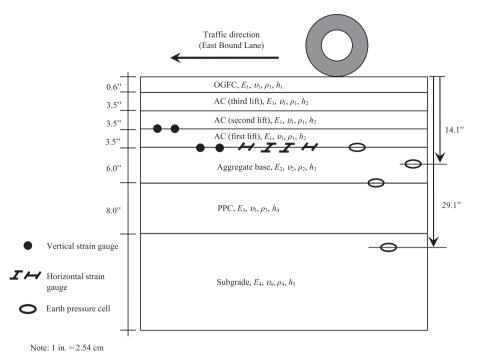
Instrumented section at MP 141 on I-40, Rio Puerco, New Mexico.
